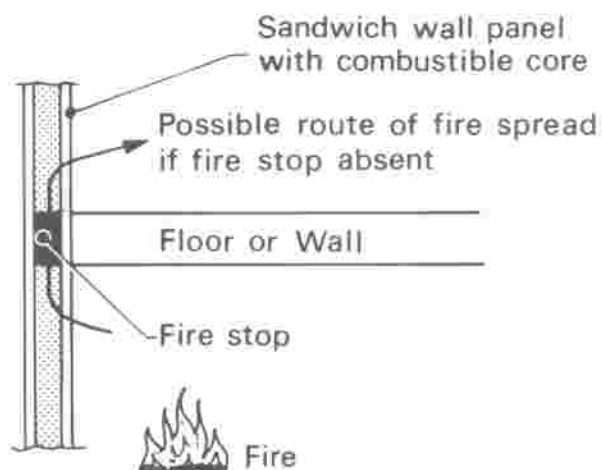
Junctions between sandwich panels and fire separating walls or floors should always be fire-stopped
